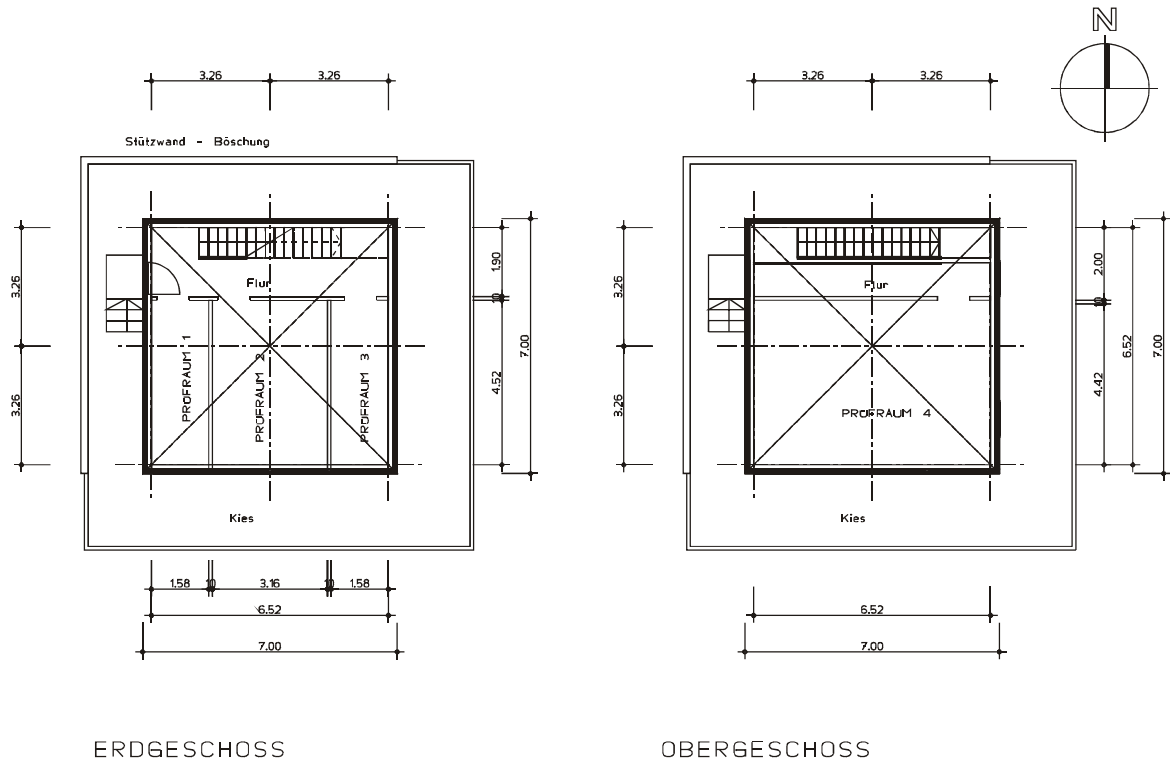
Ground plan of modular research building (left: ground floor, right: upper floor)
